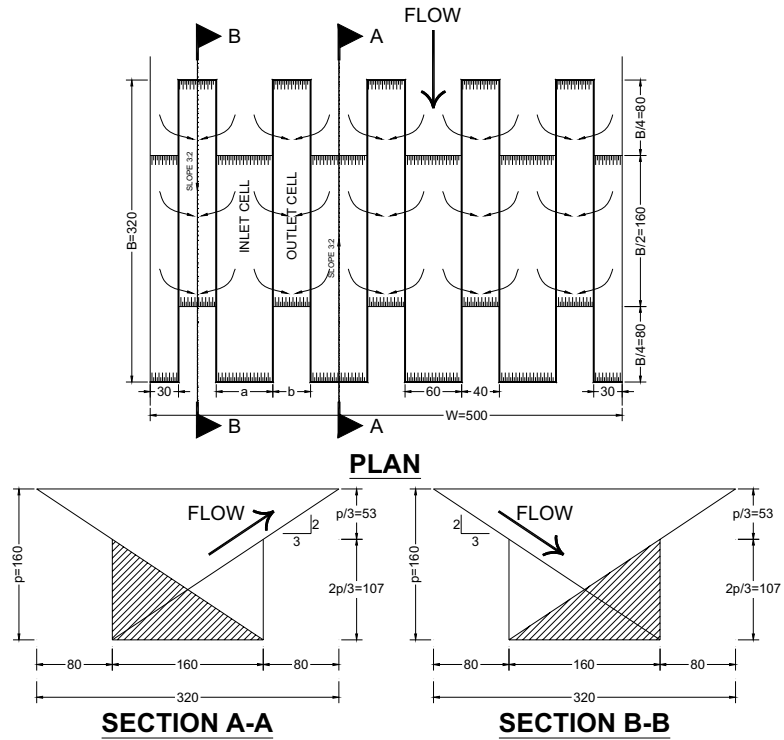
Plan and section of model P_3M_1 (both sides ramping), (dimensions in mm)
